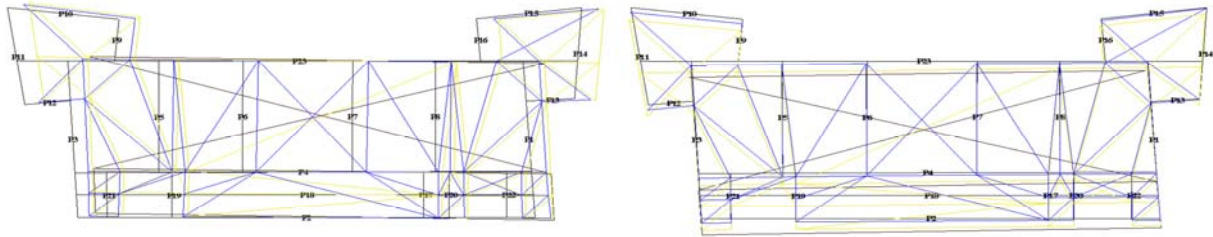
Deformed shape of the building at PL4 for critical case in X (left) and Y (right) direction (A2: tests\_min)
